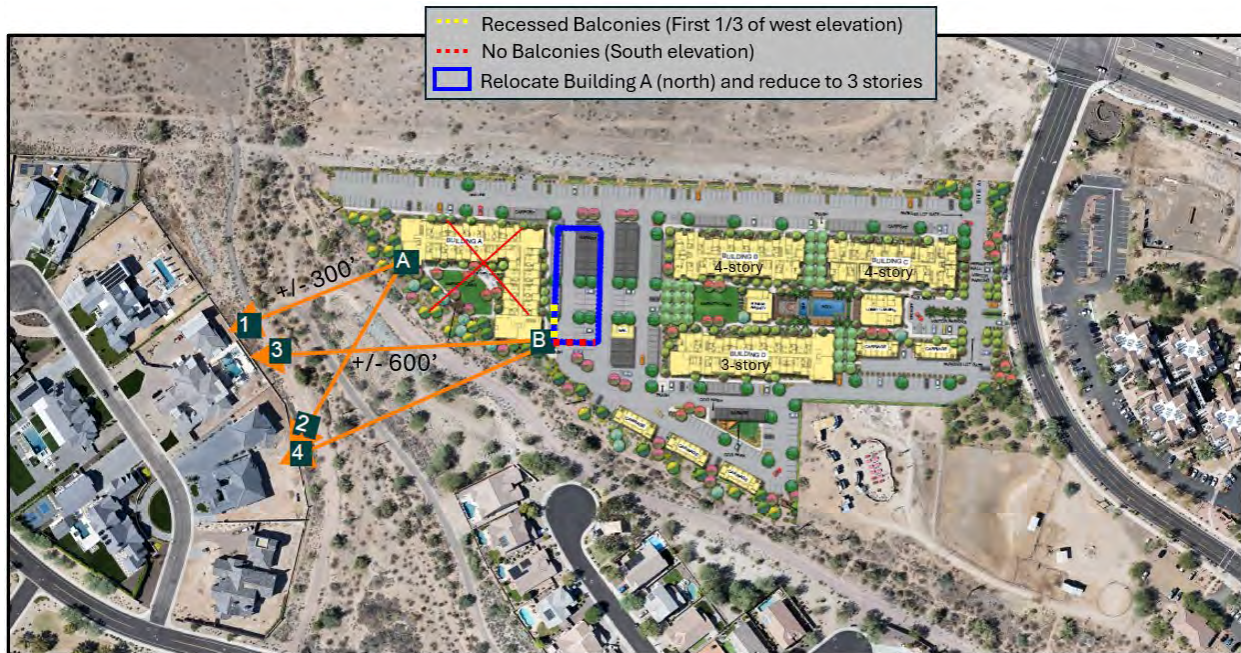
Site Plan Modifications Presented at 2nd Neighborhood Meeting
